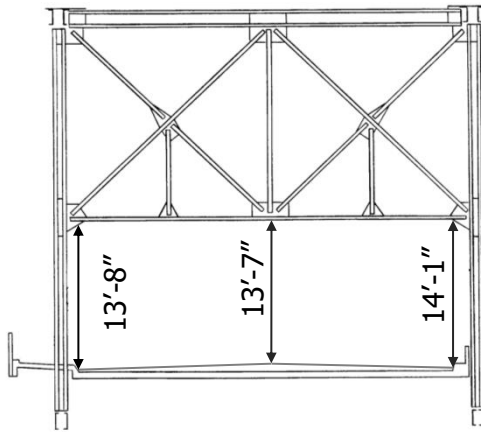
Cross-section view of a through truss bridge showing minimum vertical clearance.
